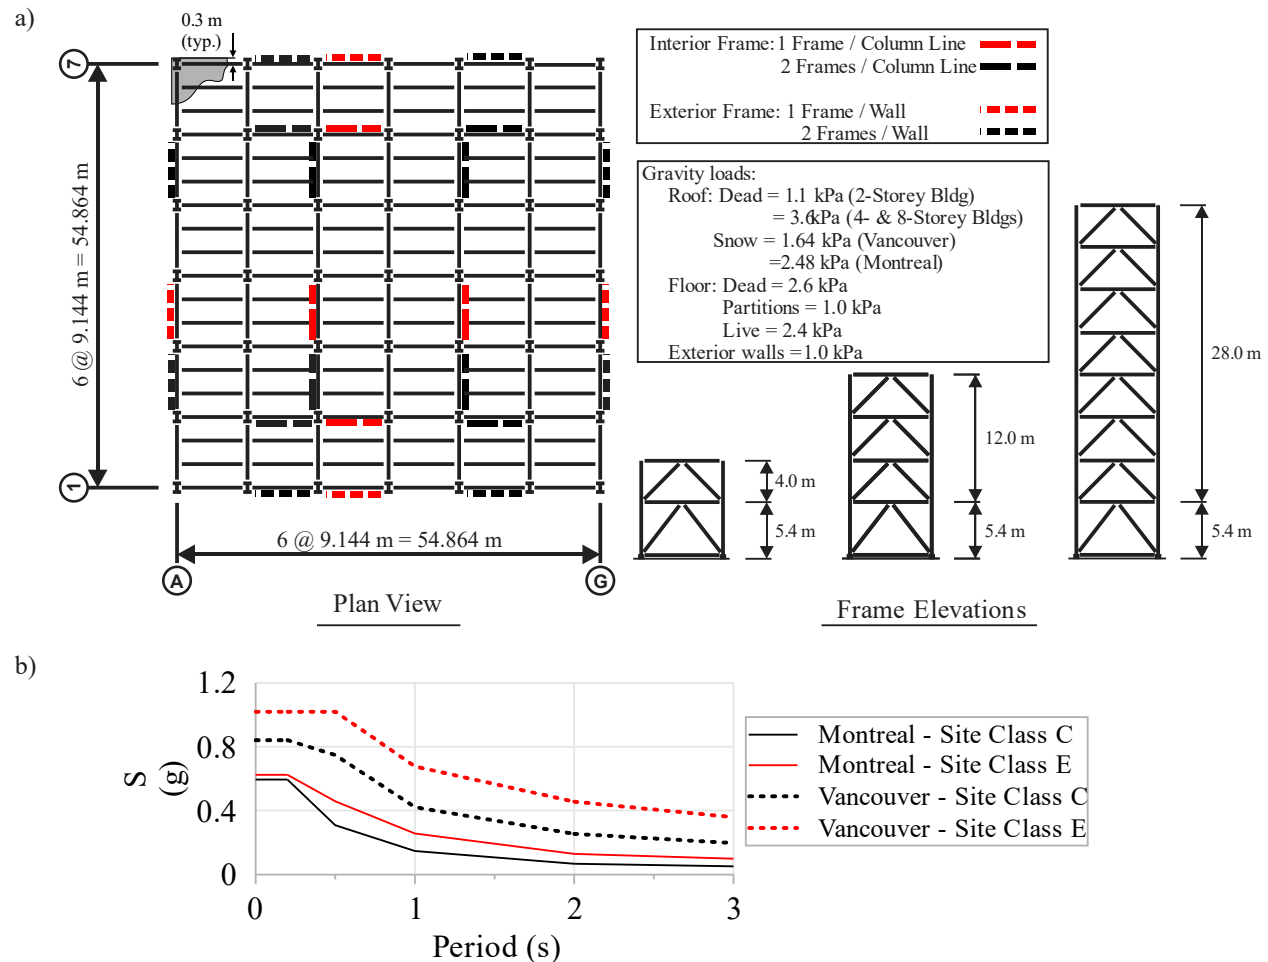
a) Structure plan view, design gravity loads and braced frame elevations of the buildings studied; and b) NBC 2015 Design Spectrum,  $S(T)$ .
